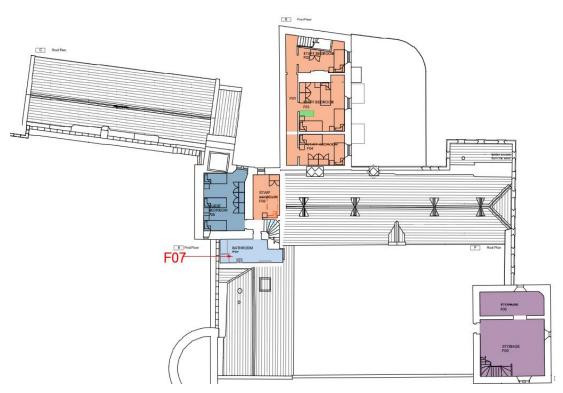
Ford Castle East Gateway, East Forecourt Wall and Handyman's cottage (NHLE 1154087) Ground Floor Bathrooms
